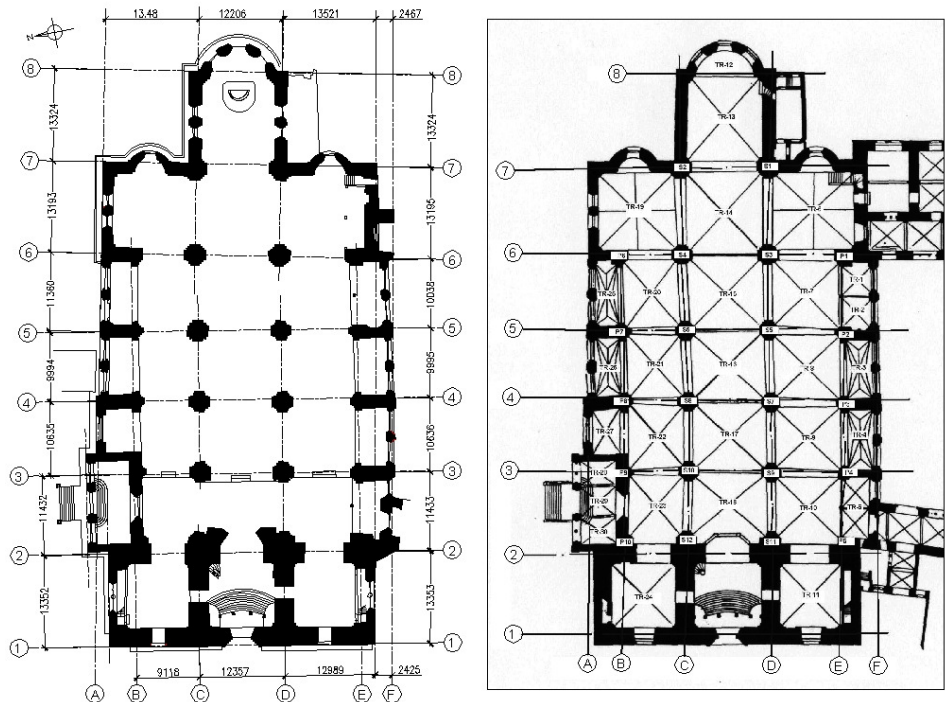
From full 3D model made plan and arch marking in plan made by Stukmanis
